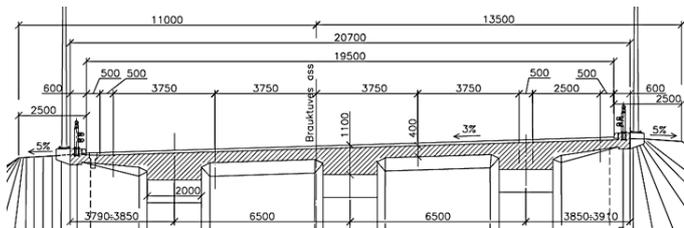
Cross section and elevation of bridge on road E22 over road V920. FE model
